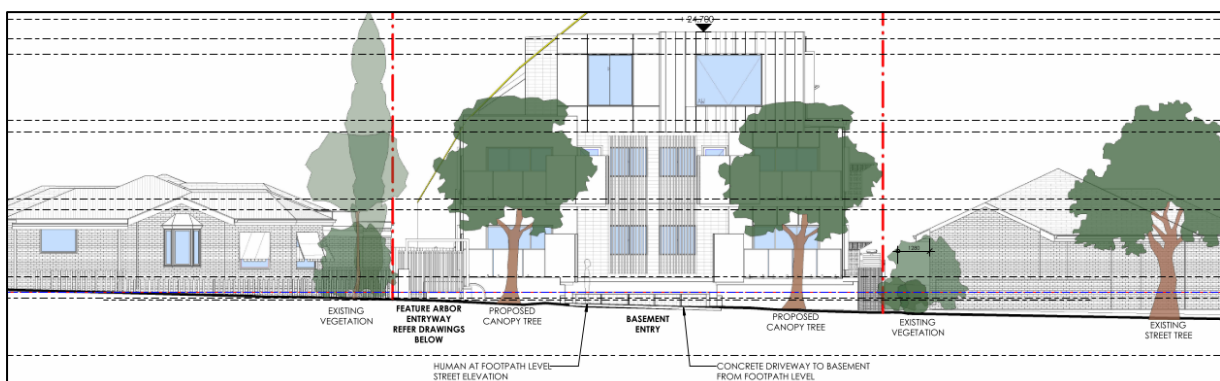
(Above): Southeast streetscape elevation showing frontage to Barrabool Road. Source: Application documents
